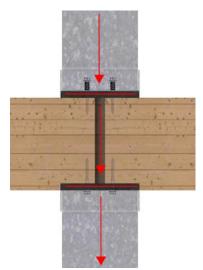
Novel CLT/CFS connection detail (image courtesy Timber Engineering, Inc)
